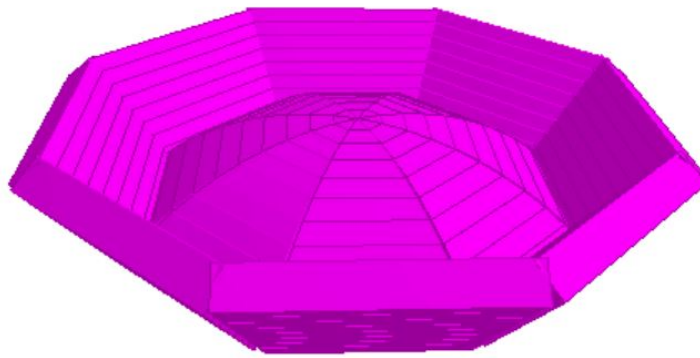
Bottom Spherical dome and conical dome modelled on STAAD Pro
